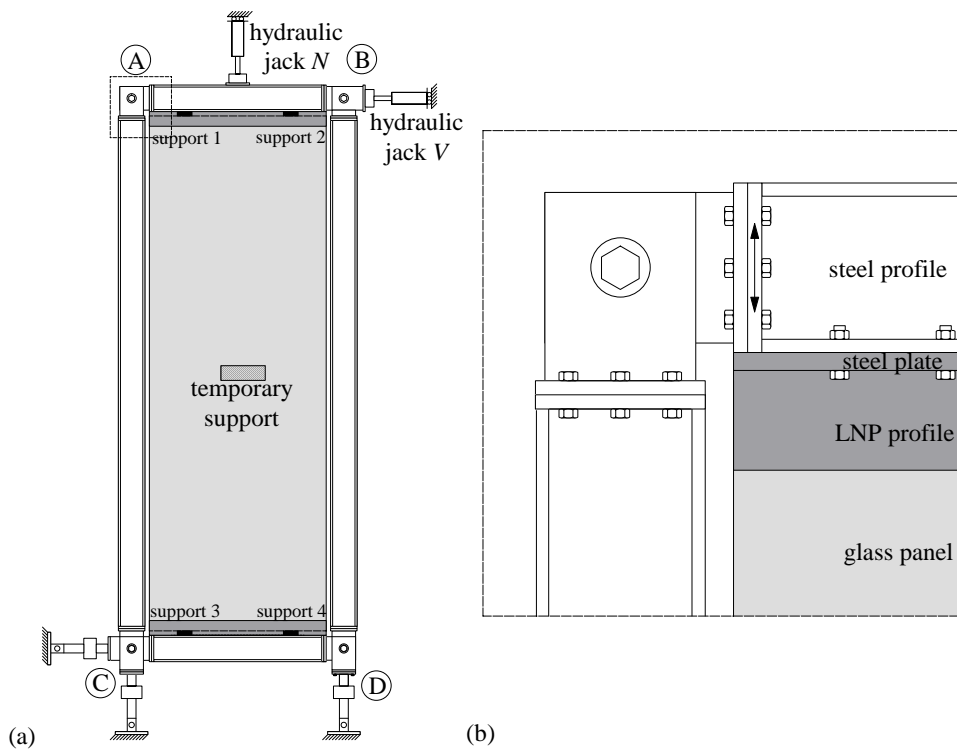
Specimen and testing frame (a) specimen positioning (b) specimen/test frame connection
